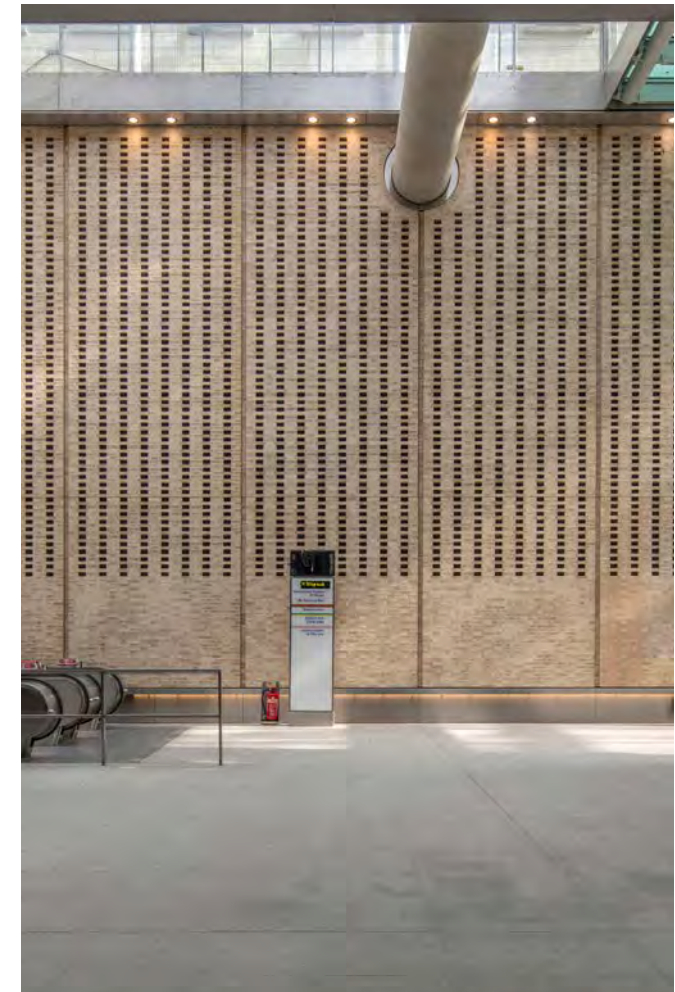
Paddington Elizabeth Line - Modular Prefabricated Brick
